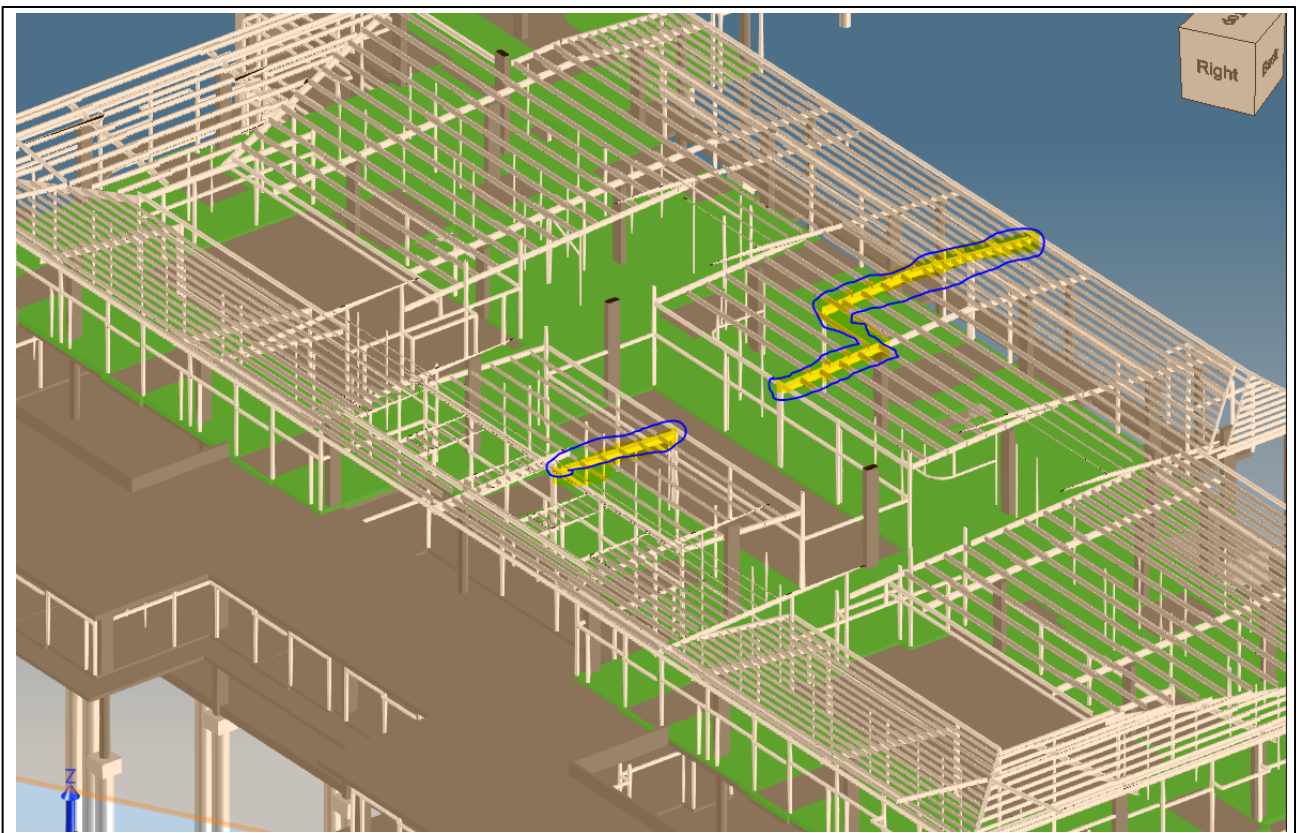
Outline of fire wall shown superimposed on roof structure – Lower Ground
